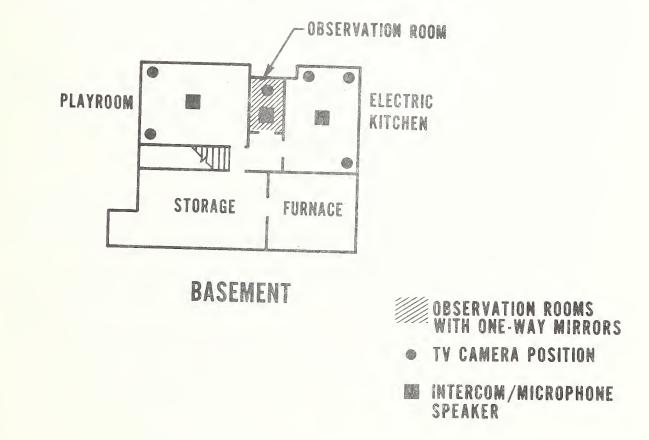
FLOOR PLAN OF NBS CONSUMER RESEARCH LABORATORY
